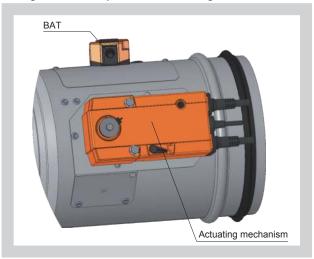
Actuating mechanism BELIMO BFL 230-T
